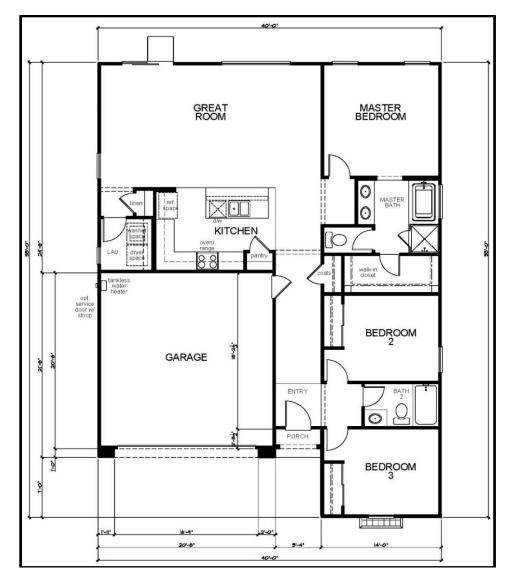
FLOOR PLANS & ELEVATIONS: Plan 6
